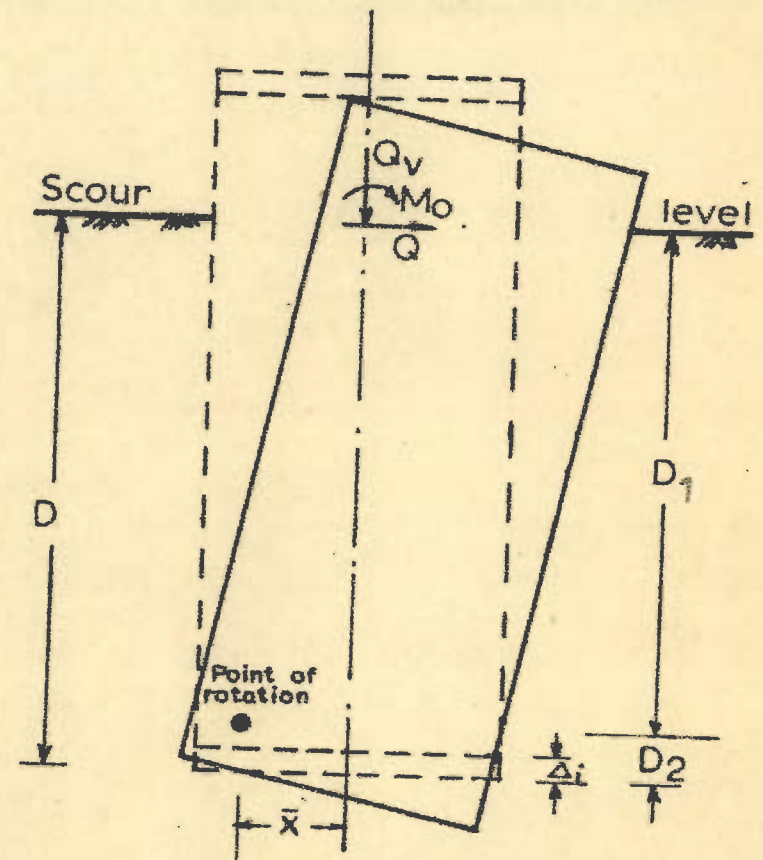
FORCES ACTING ON A WELL FOUNDATION
